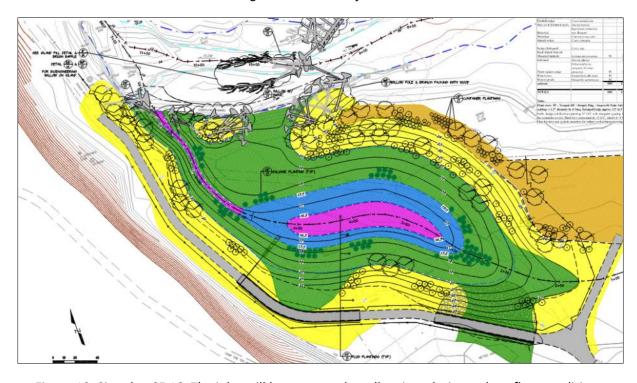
Site plan SF 16. The inlet will be excavated to allow inundation at baseflow conditions.
